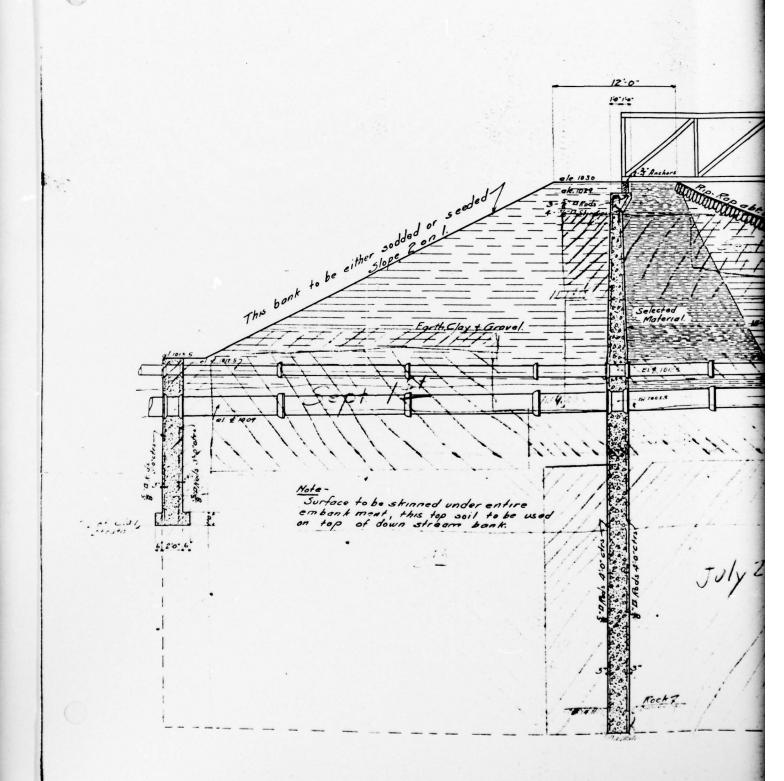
CHERRY RUN DAM GENERAL PLAN : FIELD INSPECTION NOTES
